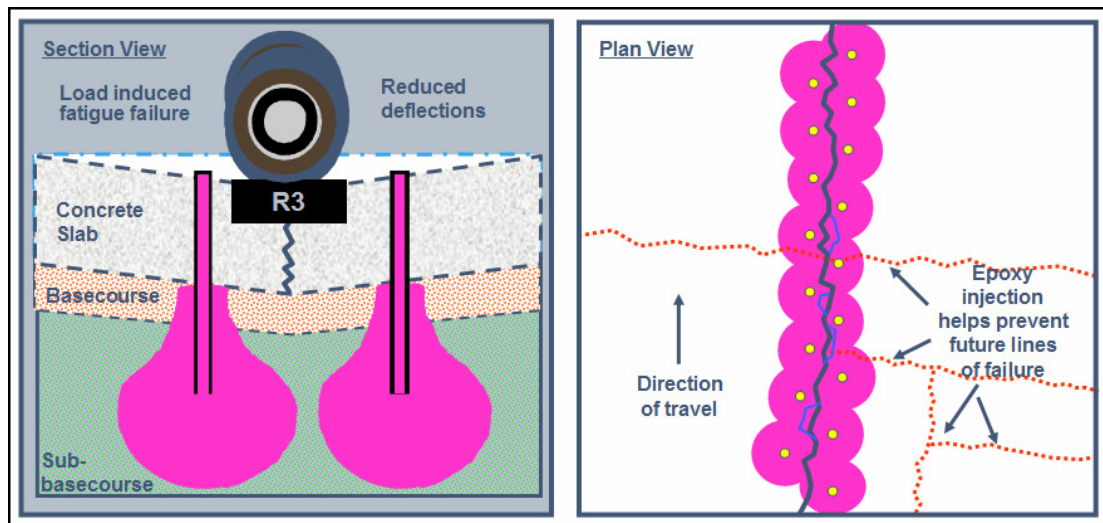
Cross Section and Plan Showing Concrete Pavement Epoxy Injection Concept
